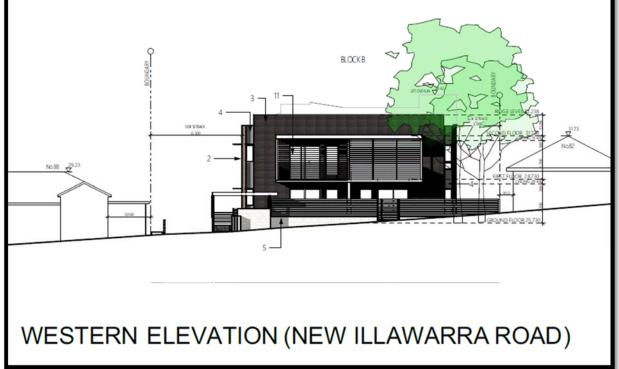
DA-2017/371 - Elevations of 84 New Illawarra Road, Bexley North
